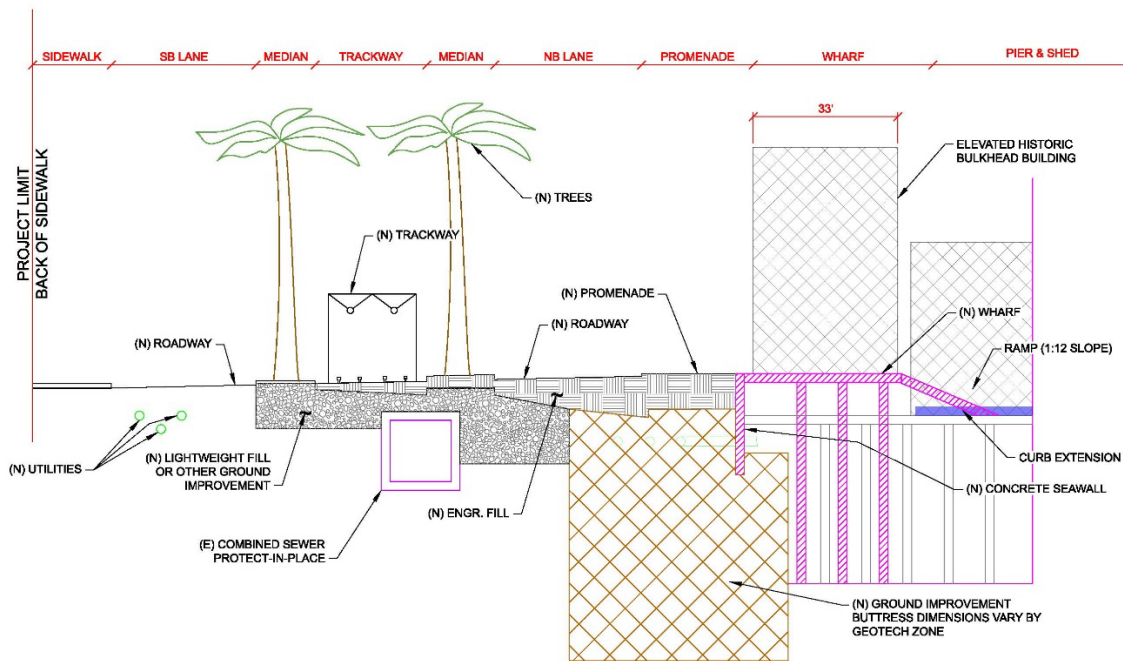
Section 1 Recommended Plan (Reach 2, Pier 19)
